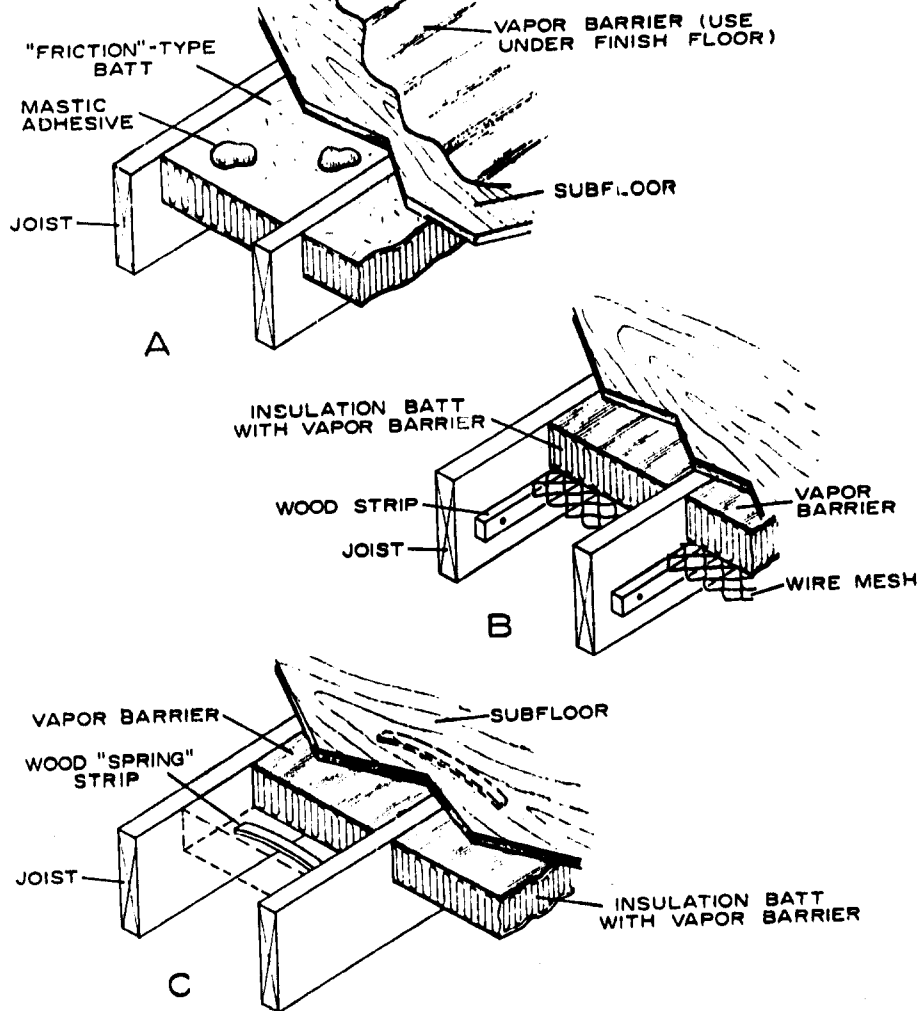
Installation of vapor barriers and insulation in floor (unheated crawl space):
